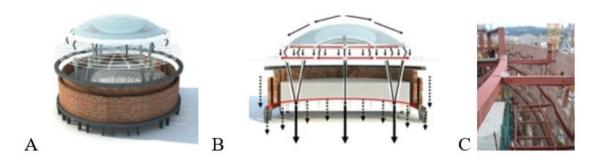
a. Structure with circular beams and angled columns; main load supported by a circular beam and metal lattice frame, b. Load transfer and distribution diagram, c. Added guard structure for exterior facade reinforcement.
